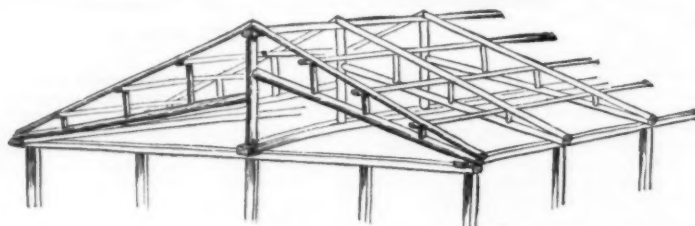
ROOF FRAME OF LARGE BUILDING.
